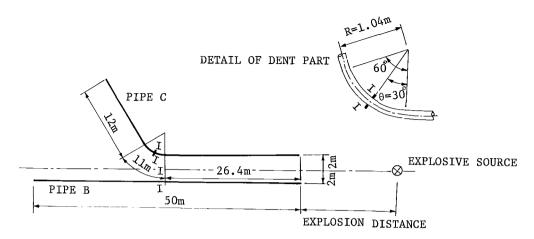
Explosion Test Arrangement of Pipes C and B
